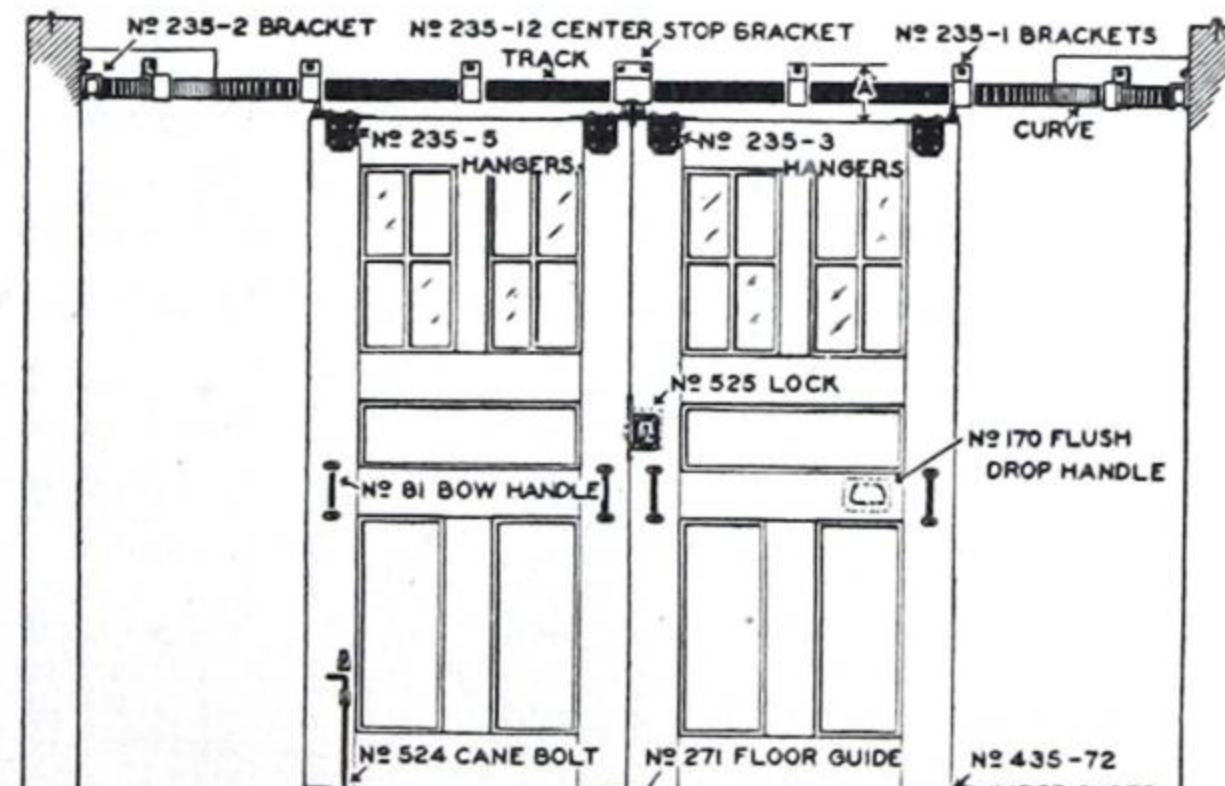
Interior elevation showing proper location and names of 235 Parts for FF-3 Set, including one 525 Lock and one 524 Cane Bottom Bolt.
